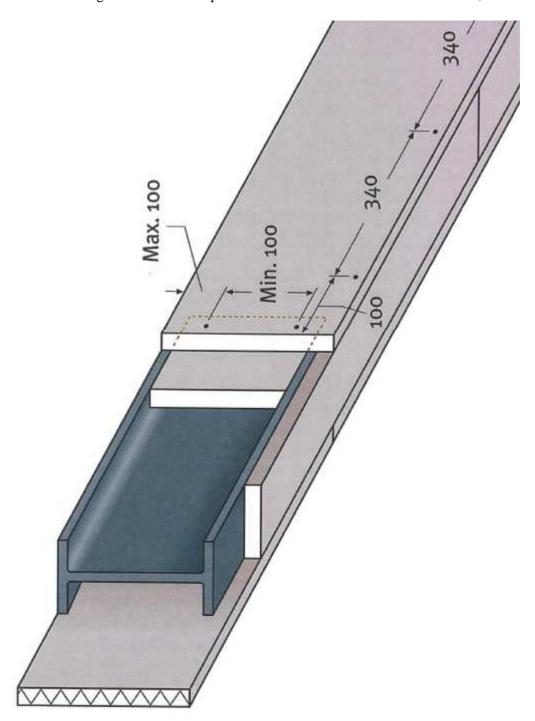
Position of screws in open profiled steel – three sided Screws 3,8 \times 45 mm used for 25 mm fire protection Screws 5,0 \times 90 mm used for 50 mm fire protection
